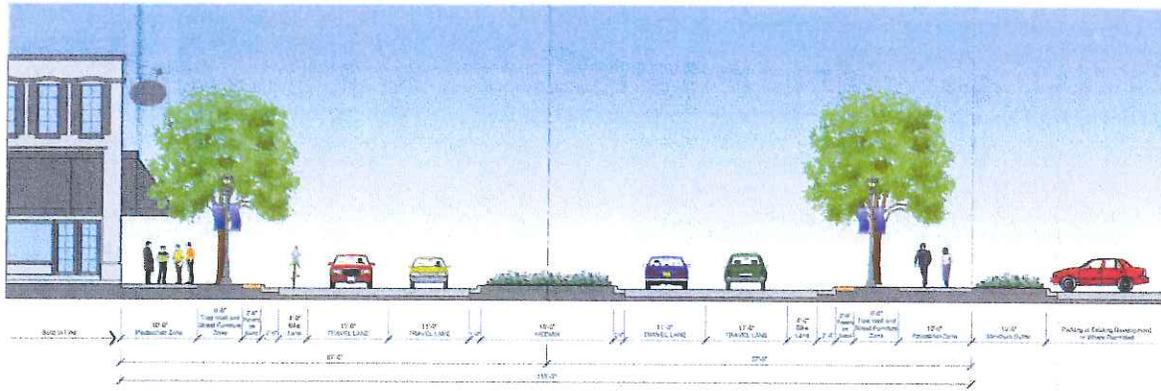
Four Lane Village Center Boulevard Cross-section
